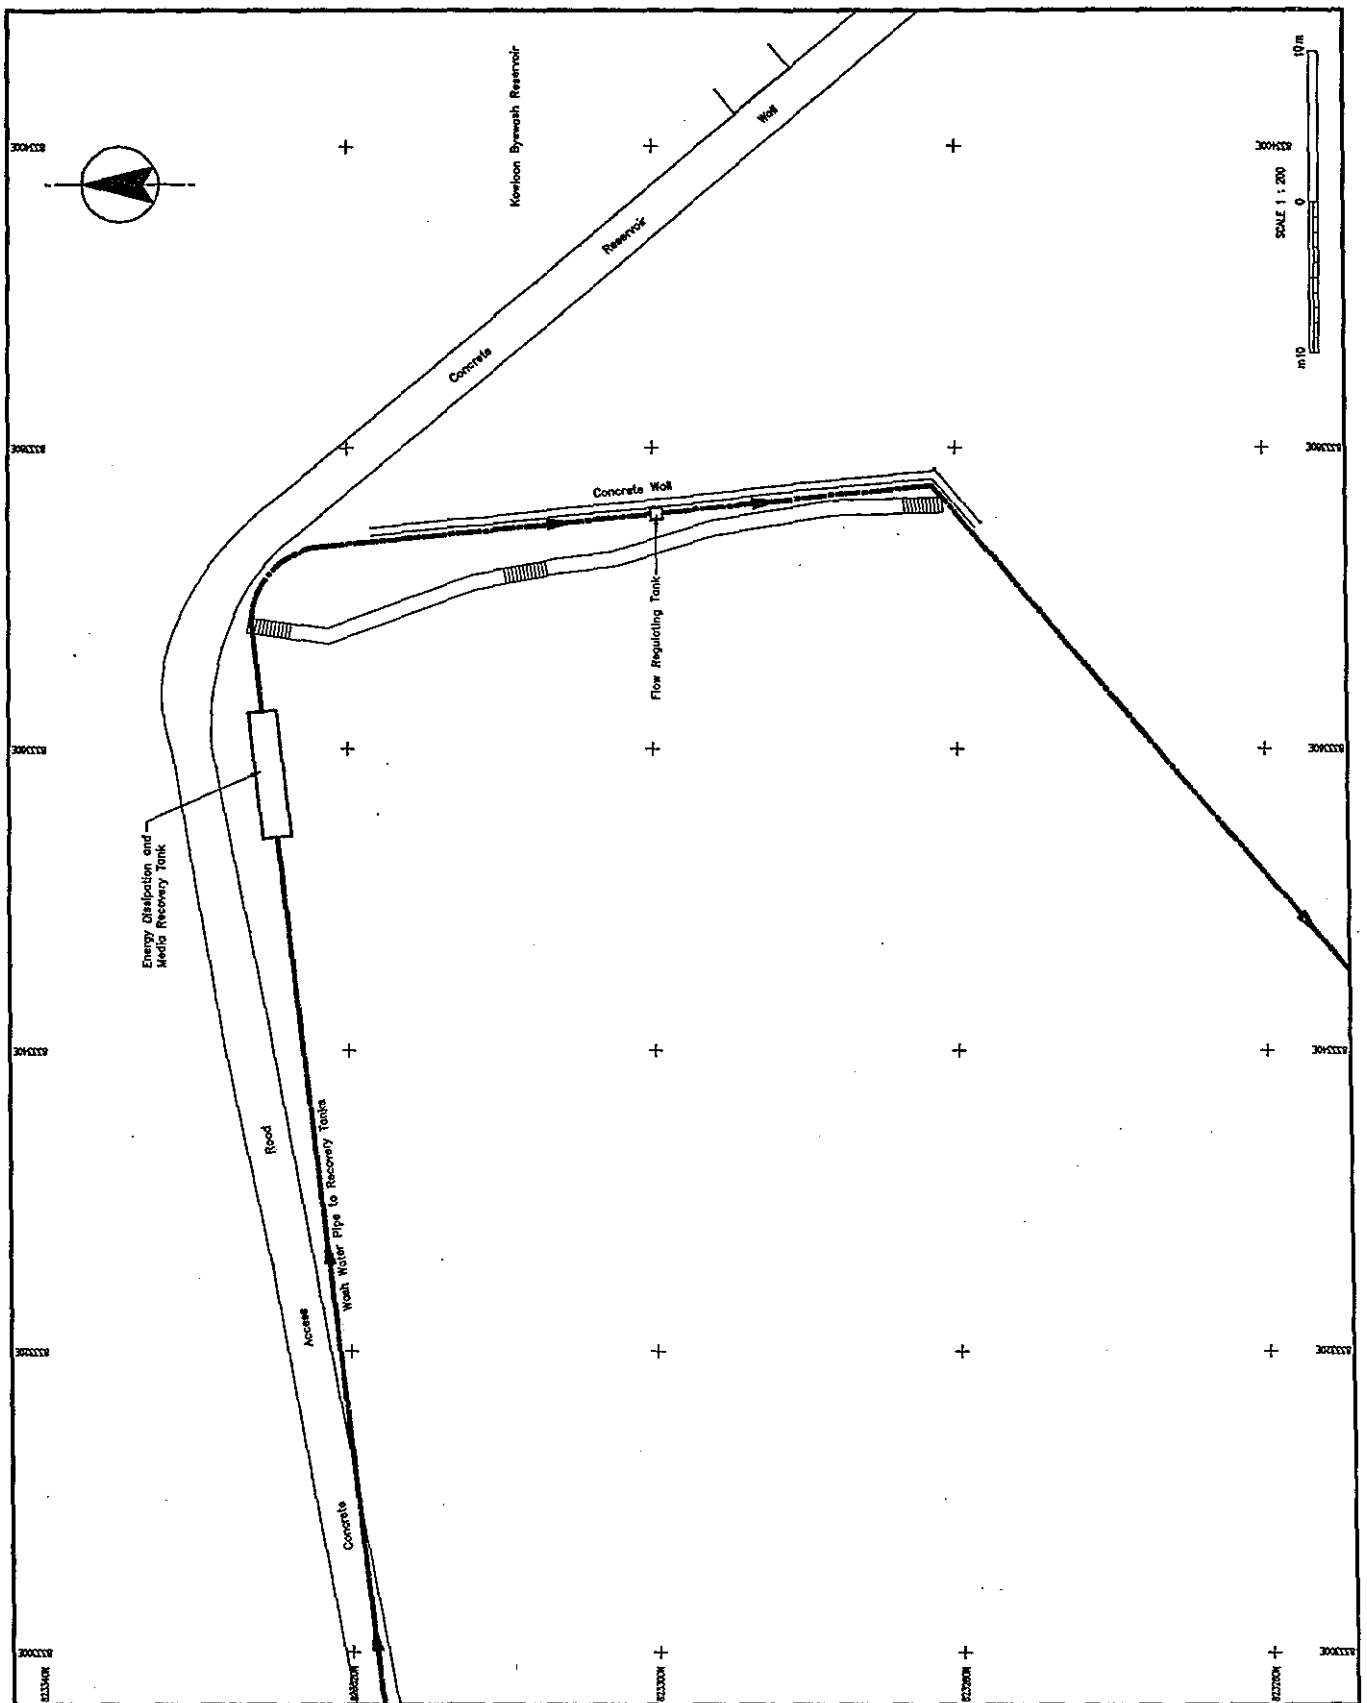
Layout of Proposed Sludge Pipeline - Shek Lei Pui to Tai Po Road
